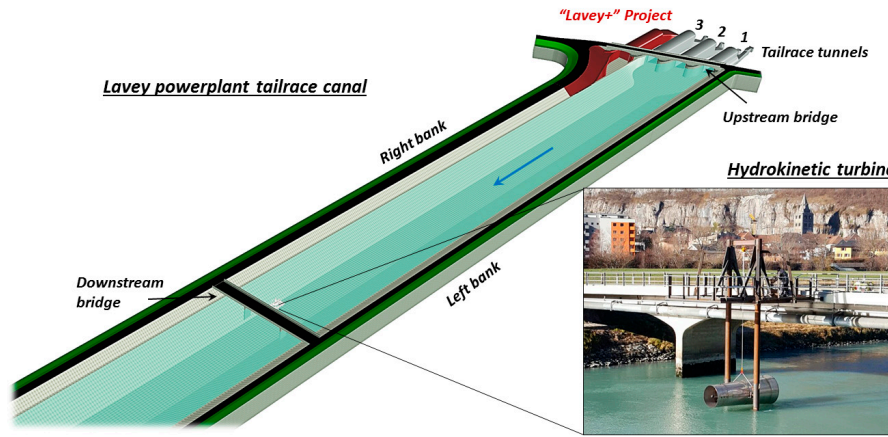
Tailrace canal of Lavey—full 3D CAD isometric view and photograph with the open-air platform installed in the canal toward the downstream bridge.
